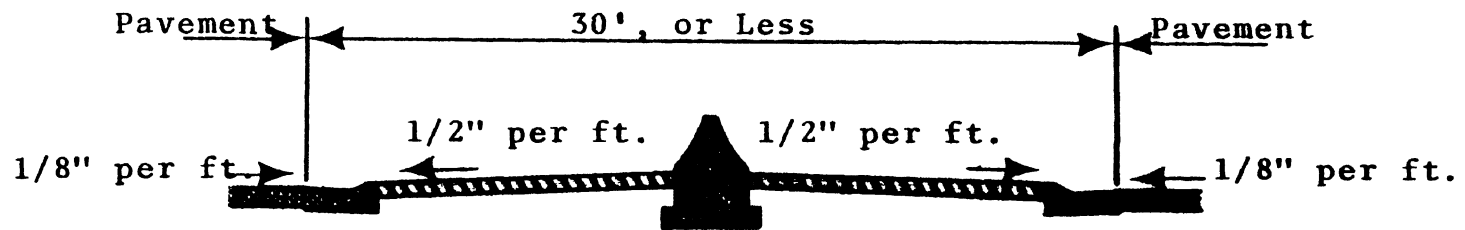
TYPICAL MEDIAN CROSS SECTION WITH CURB B AND THE CONCRETE SAFETY PARAPET
